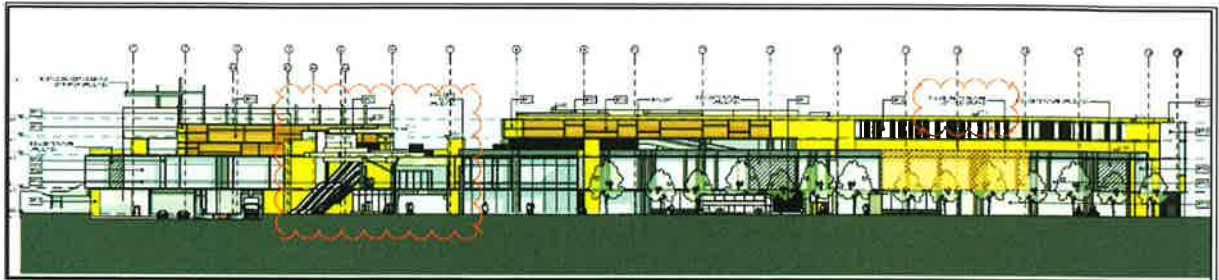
Southern Elevation - Captain Cook Drive (Proposed) (Source: Proponent's modification application, 2016).
